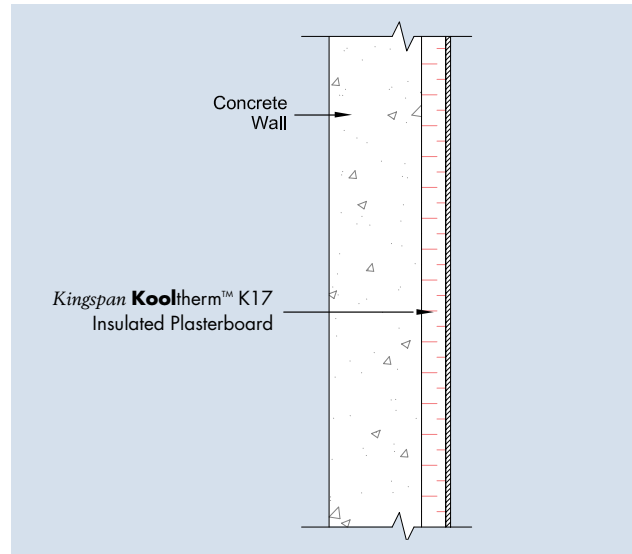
Side elevation of *Kingspan Kooltherm™ K17 Insulated Plasterboard* bonded to a concrete wall
